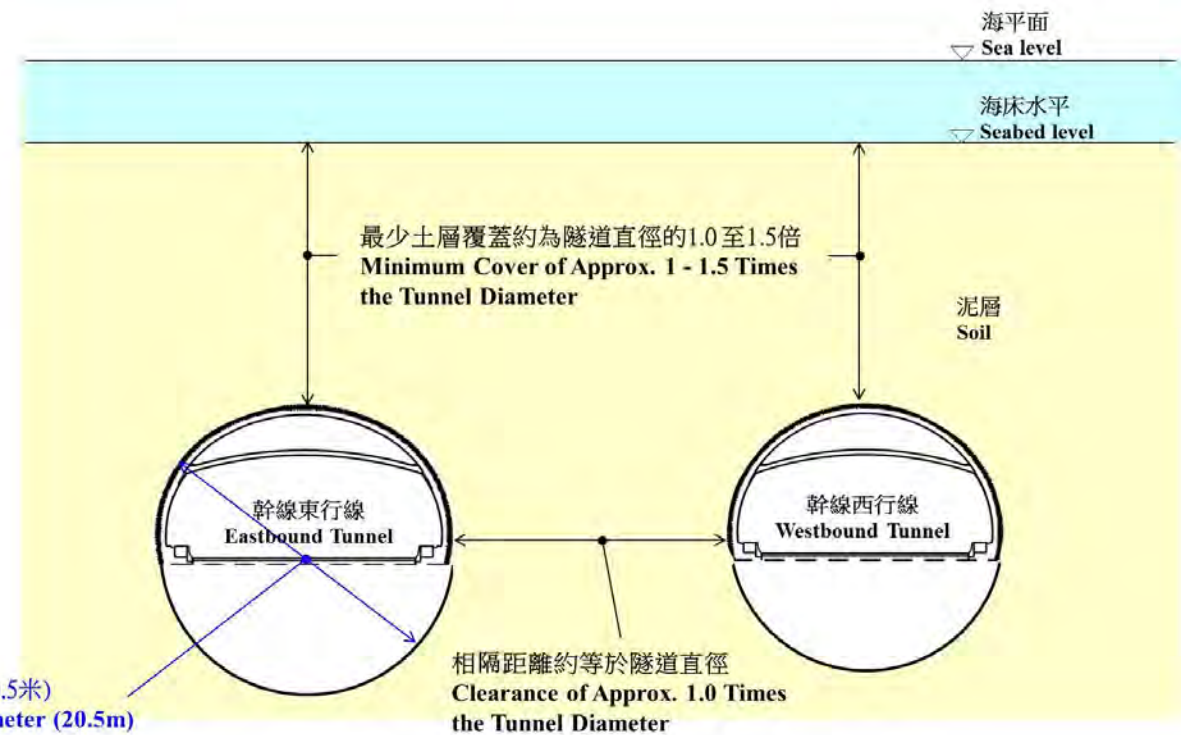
Required Soil Cover for Tunnel Boring Machine
